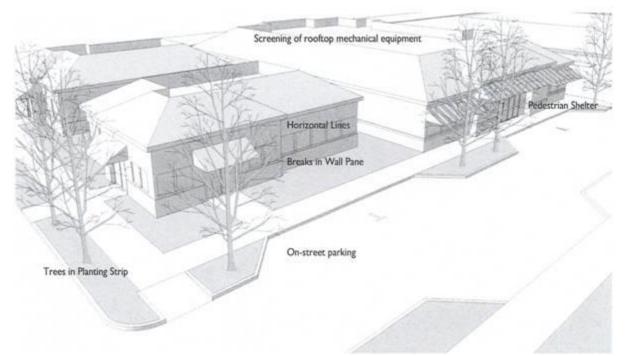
Articulation of Single-Story Buildings and Typical Pedestrian Shelters
